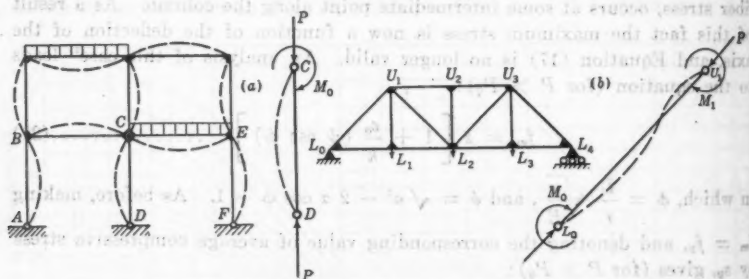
THE COLUMN IN RIGID FRAME CONSTRUCTION.
